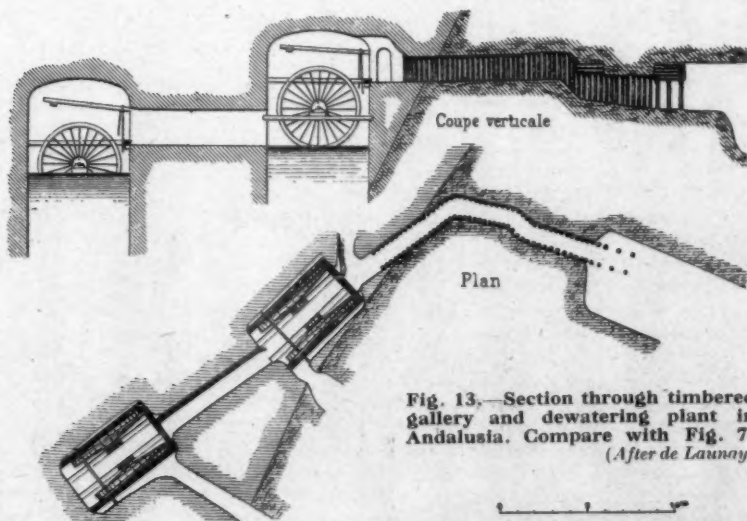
Section through timbered gallery and dewatering plant in Andalusia. Compare with Fig. 7. (After de Launay)
